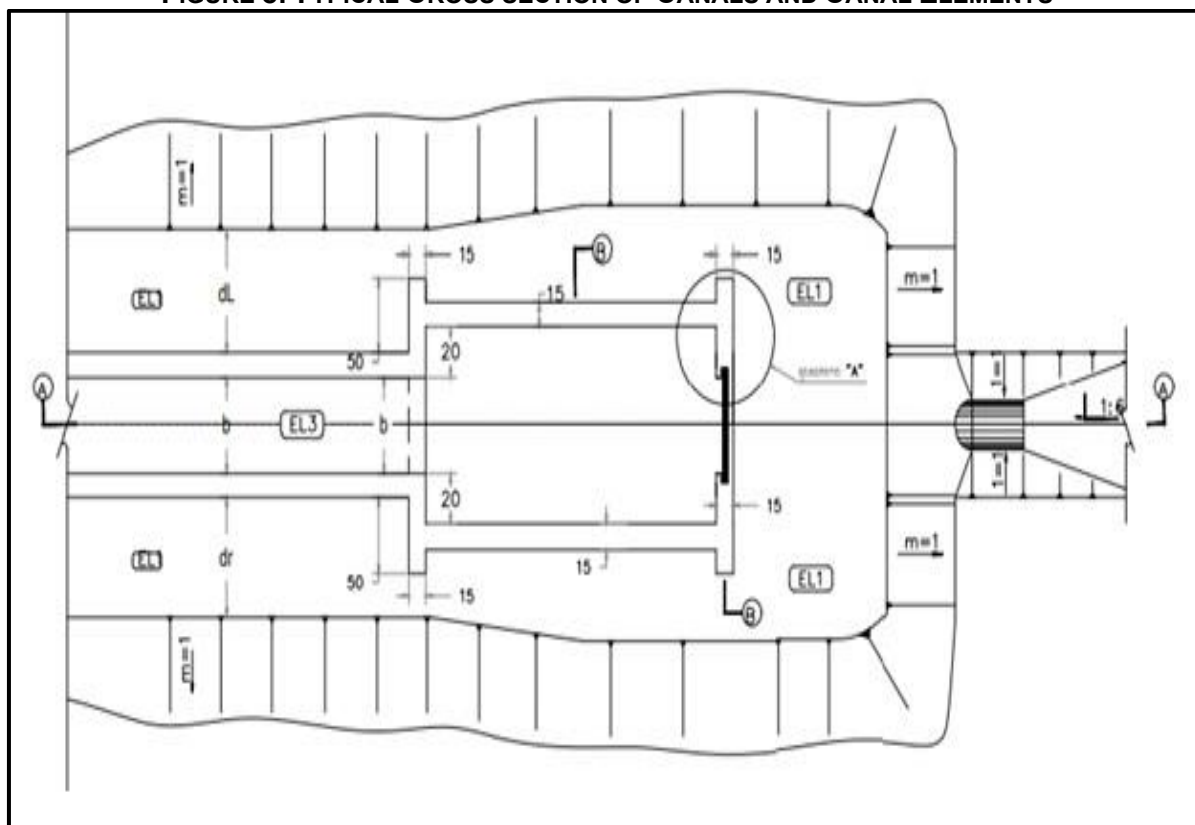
TYPICAL CROSS SECTION OF CANALS AND CANAL ELEMENTS
